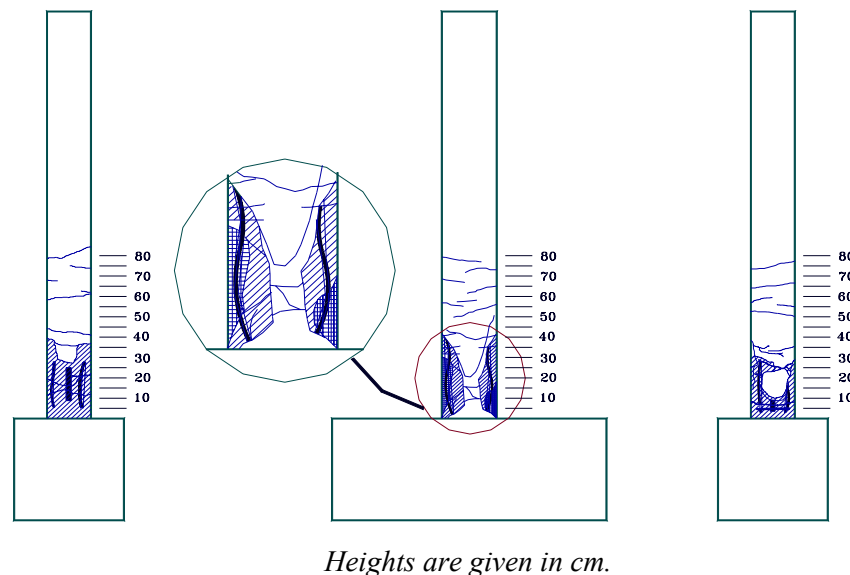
Cracking Pattern of Specimen B-1 at the End of the Statically Reversed Cyclic Loading Test
